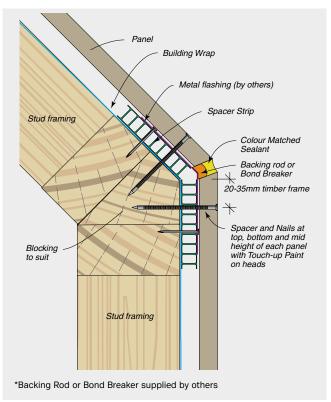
Obtuse Angle Corner Detail – With Metal Flashing and Colour Matched Sealant – Plan View
